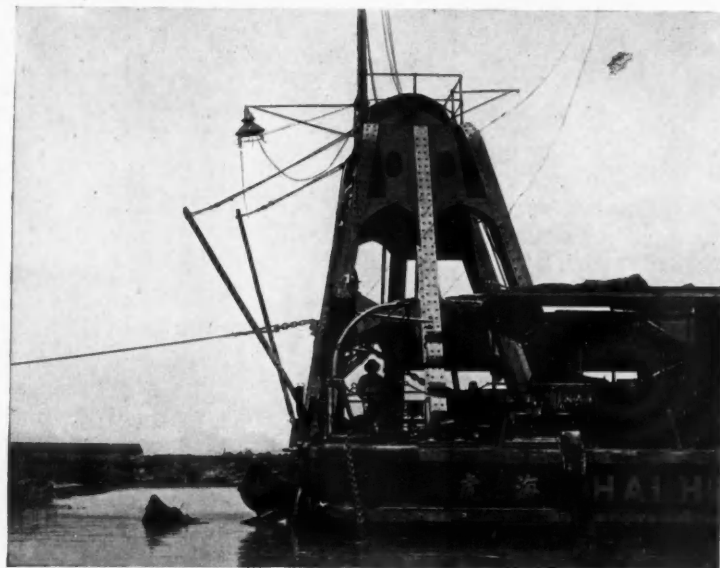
Working End of Bucket Dredger "Hai Hu"
